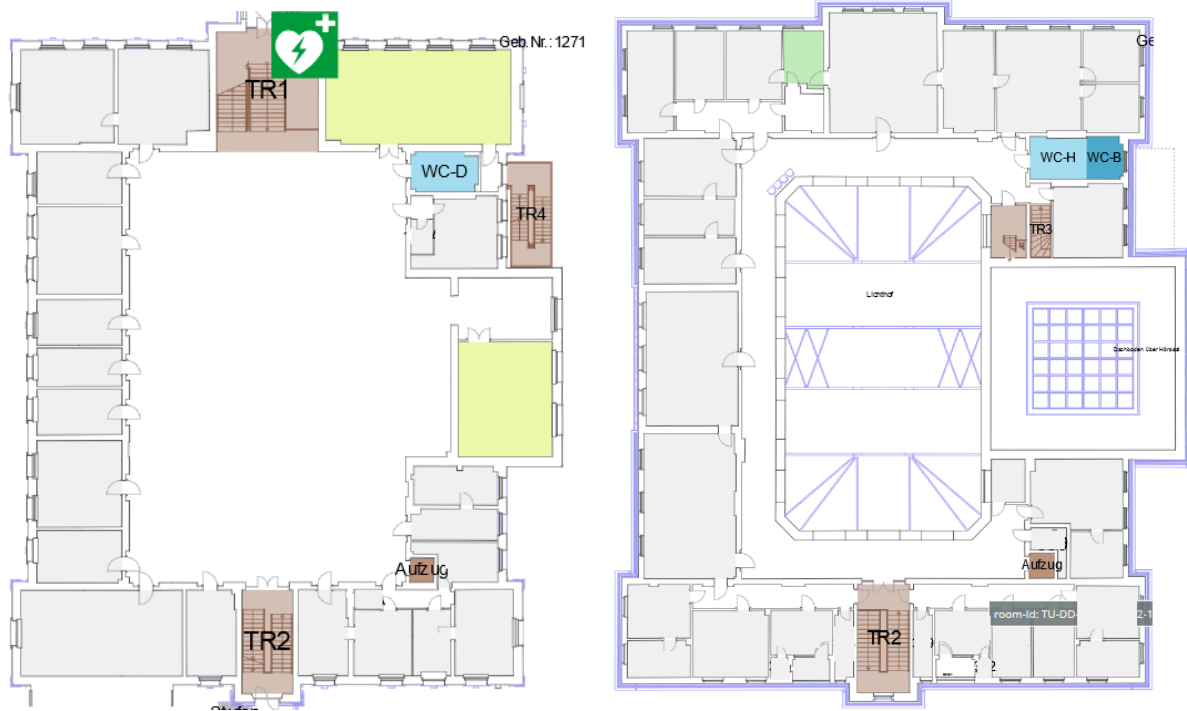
Ground floor and second floor, Görjes Building's floor plans (<https://navigator.tu-dresden.de>).
